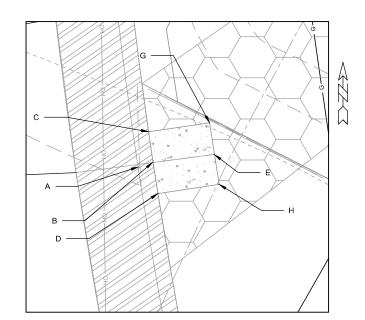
DETAIL POINT ELEVATIONS/DESCRIPTIONS
